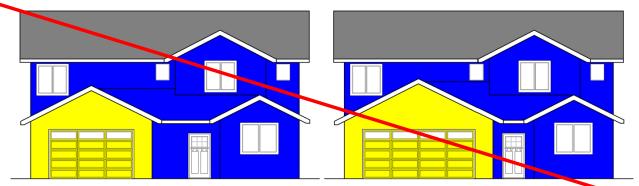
A Garage (yellow) comprises less than half the lateral dimension of the facade (yellow plus blue)
